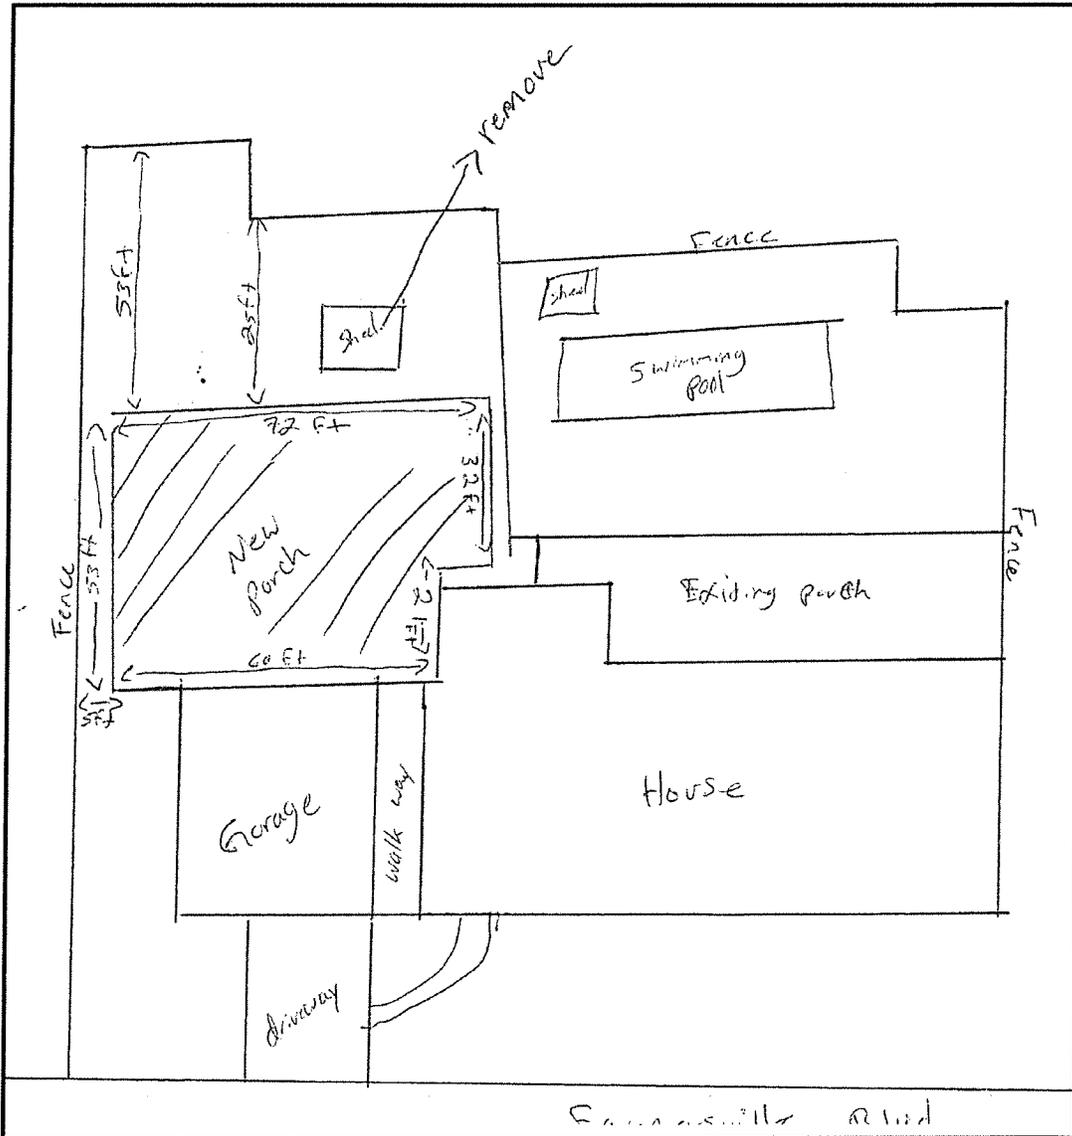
Site Plan Submitted by Applicant for Patio Cover (labeled "New Porch")
